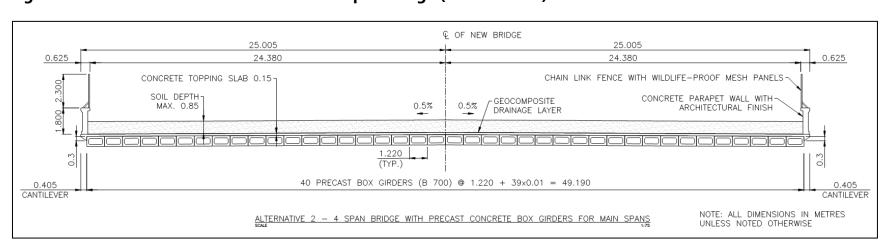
Alternative 2 - Wildlife Overpass (4-Span Bridge) - Profile View
